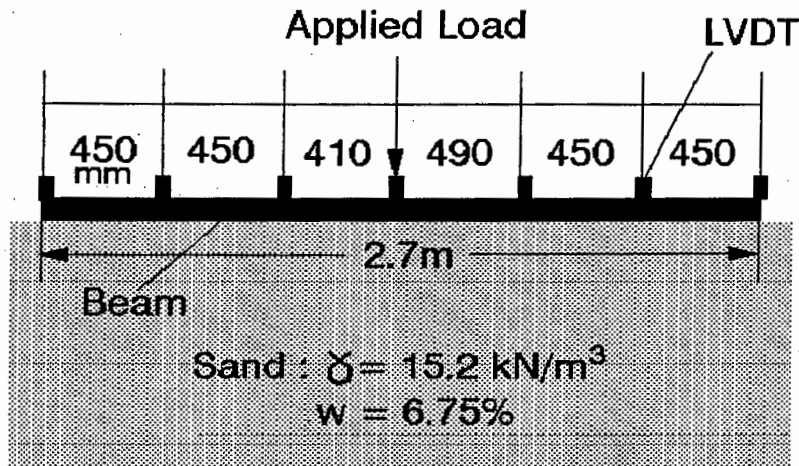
Schematic of beam on sand foundation in laboratory test
